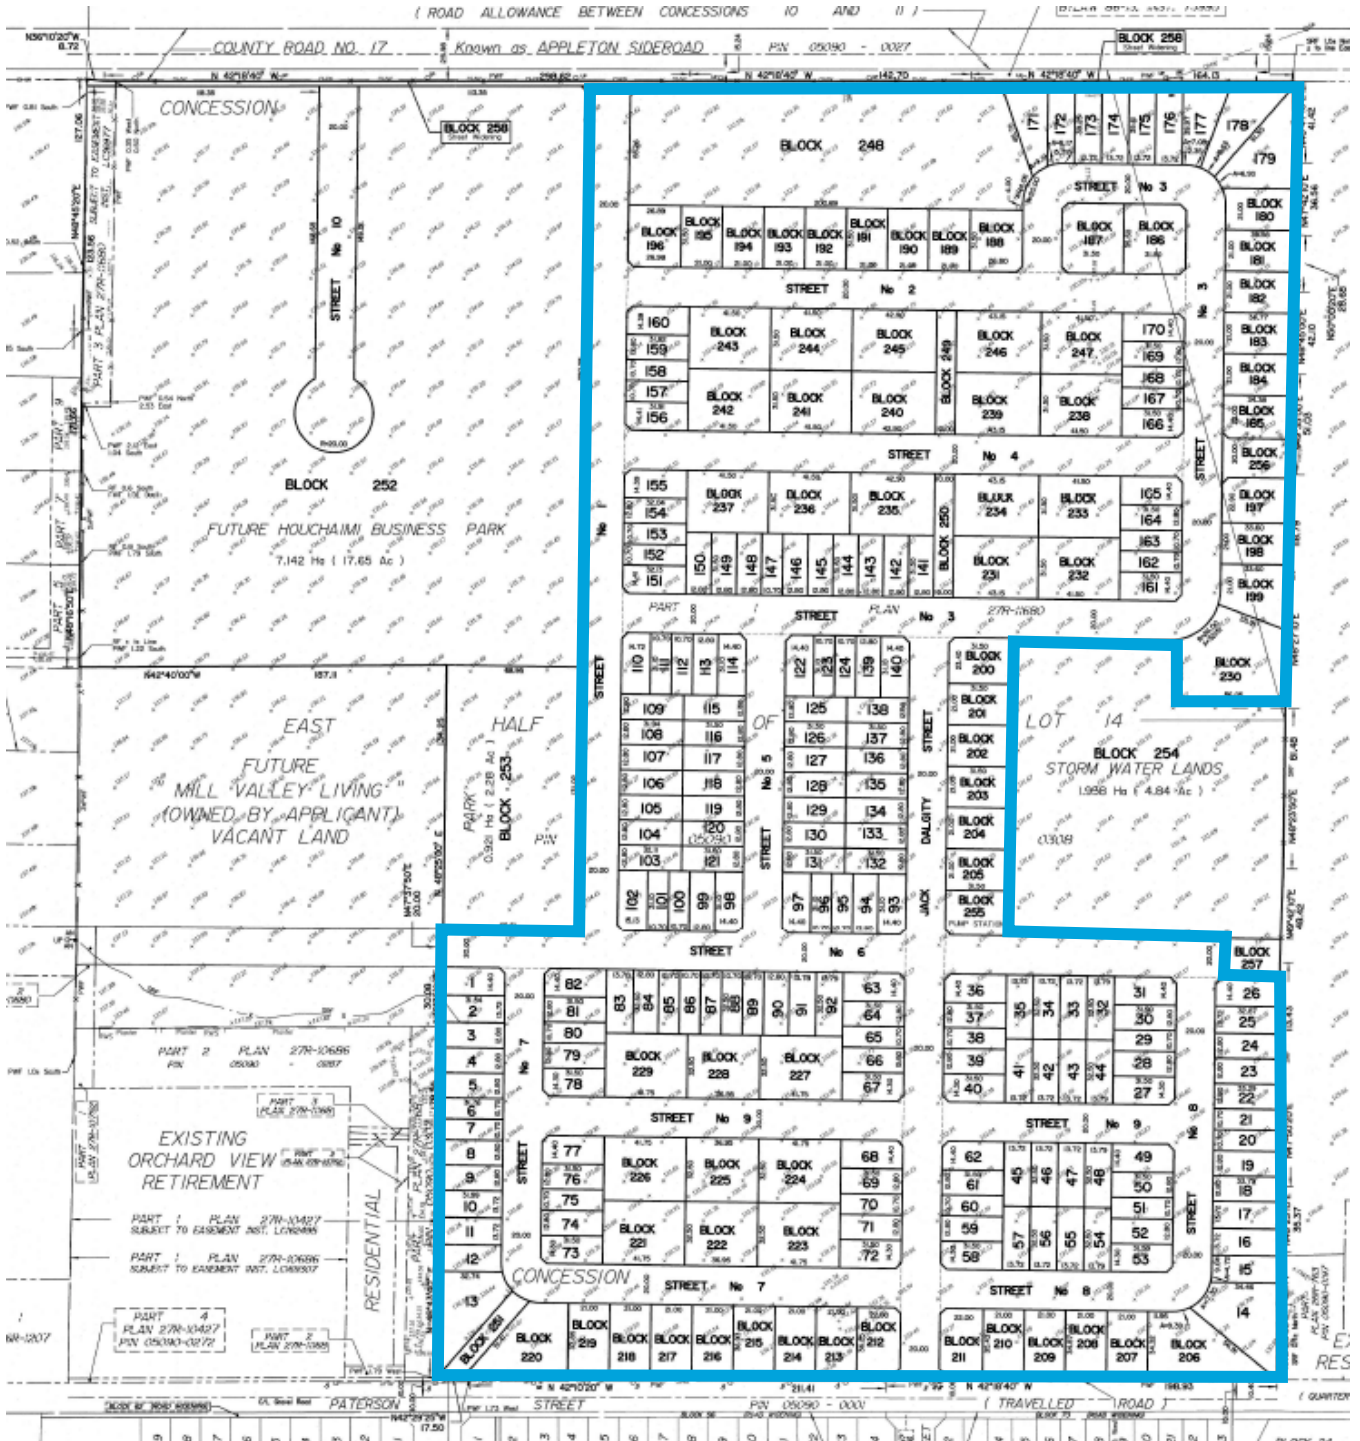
Excerpt of Draft Plan of Subdivision, residential area outlined in blue
